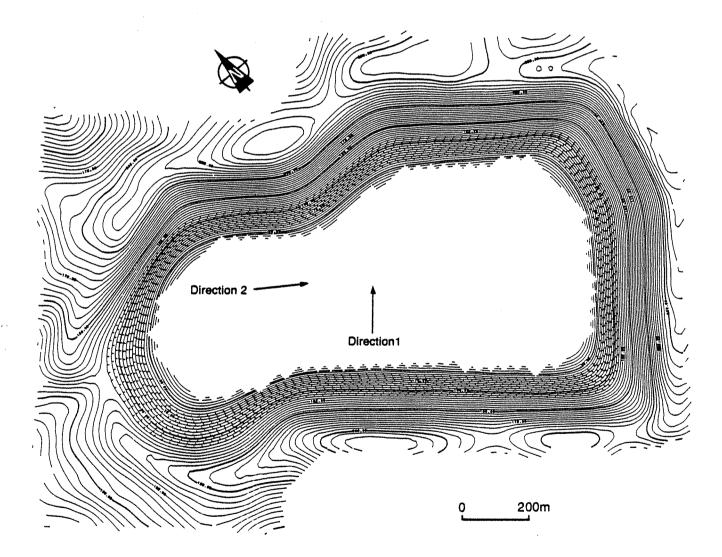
B. Plan showing final development stage of the quarry. Floor not shown.
